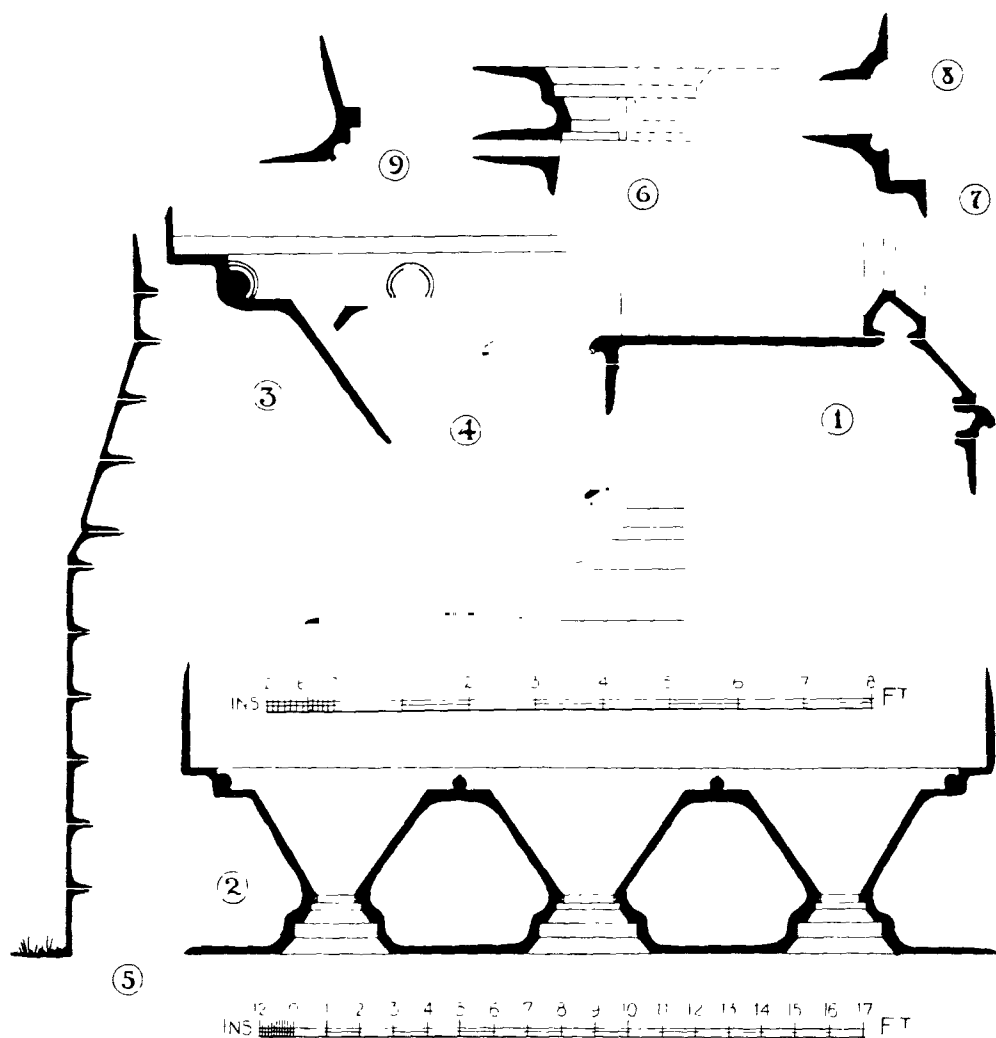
Kildrumny Castle: Moulded detail—(1), Section through Chapel Window; (2), Plan of Chapel Window; (3 and 4), Enlarged Plans of Chapel Window; (5), Profile of Base of Warden's Tower; (6), Plan of West Window, south wall of Hall; (7), Moulding at interior of reveal, east jamb of West Window; (8), Moulding at exterior reveal; (9), Moulding on Door of Maryculter Church.
